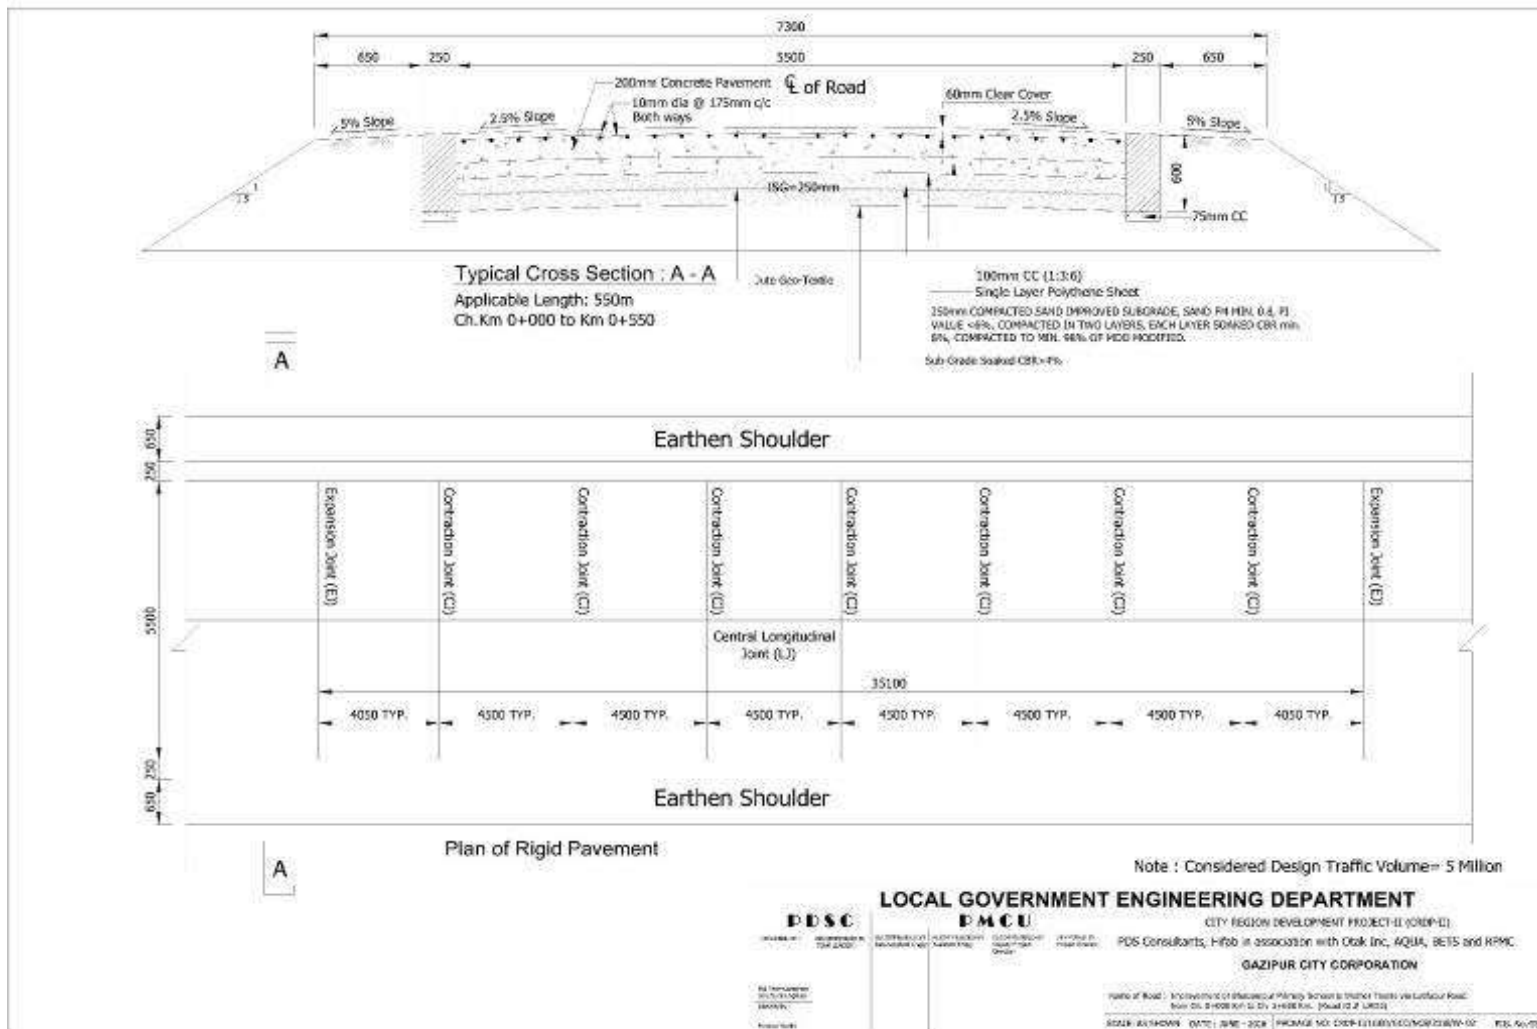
Cross section of Bhabanipur Primary School to Mother Textile via Lotifpur road. (Ch. 0+3600m)
